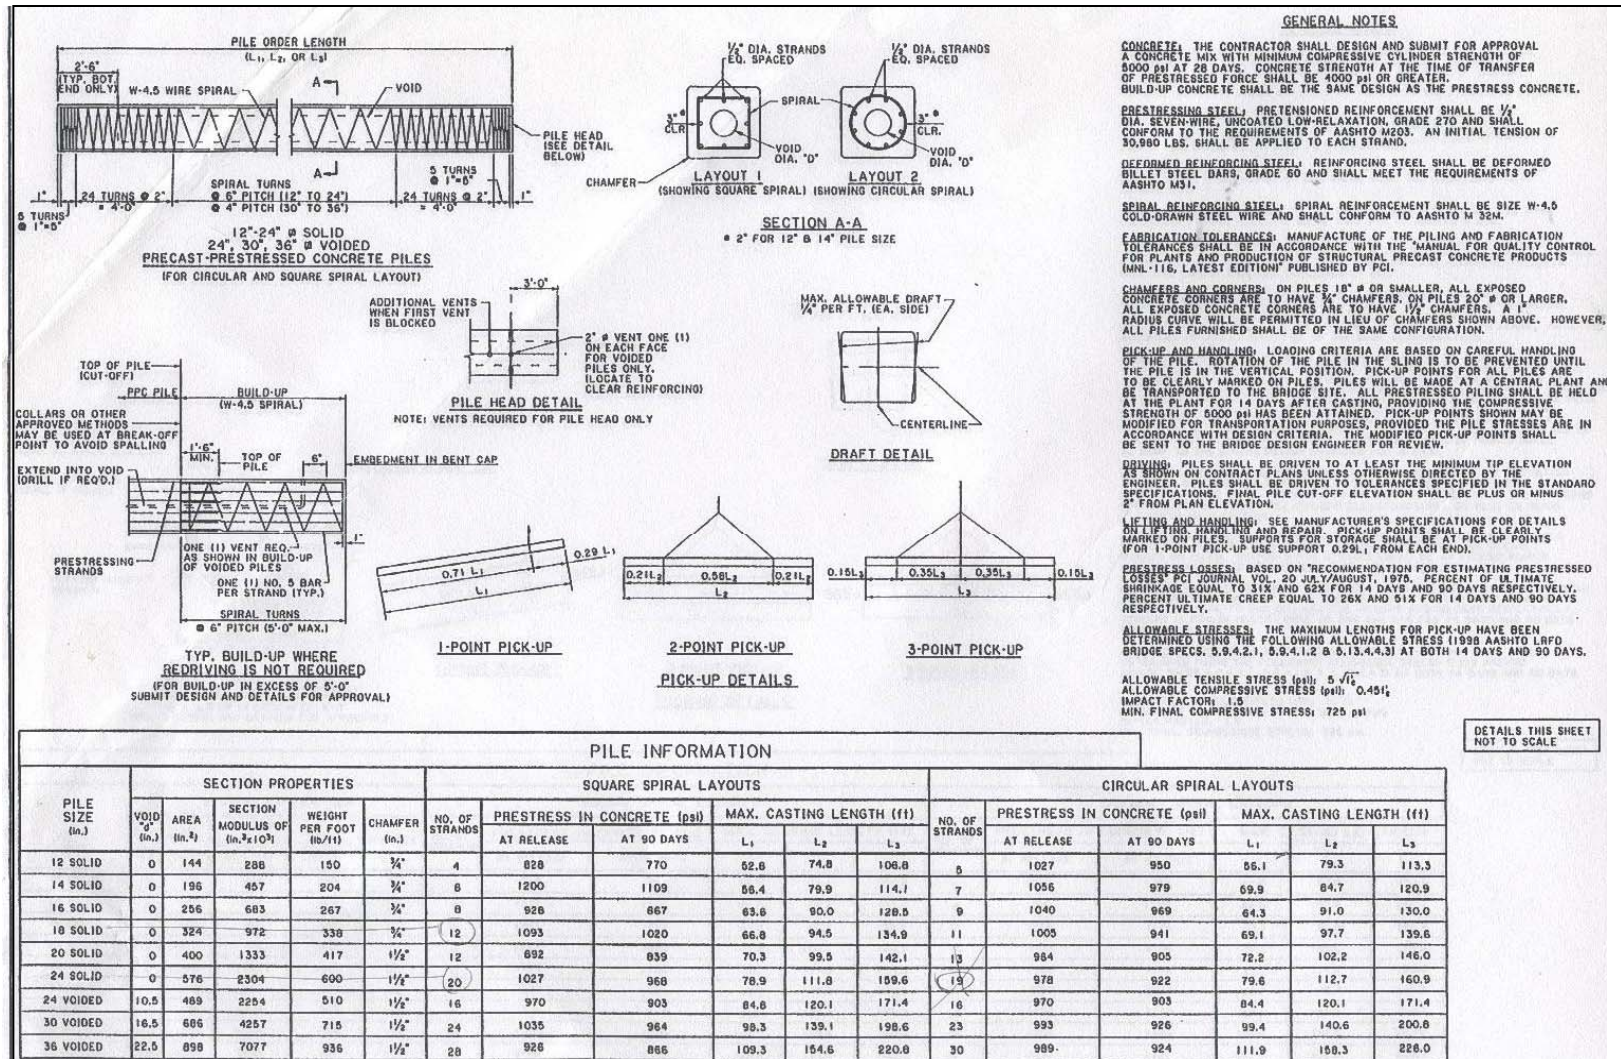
Details of Precast-Prestressed Concrete Piles, Standard Detail: CS-216 (LA-DOTD BDM 2004)
